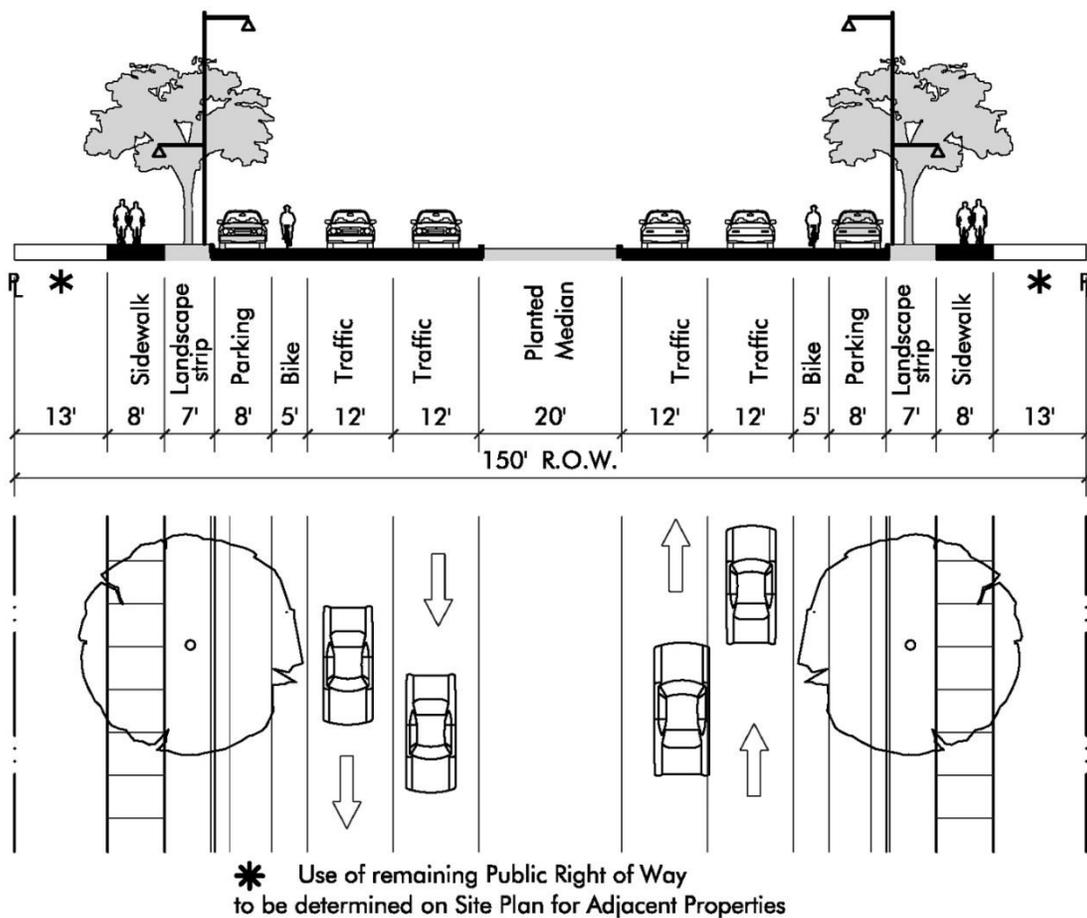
Sample Cross-Section for 12<sup>th</sup> Street north of Sawmill Rd. recommended by the Sawmill/Wells Park Sector Development Plan. (Note: element widths are approximate).
